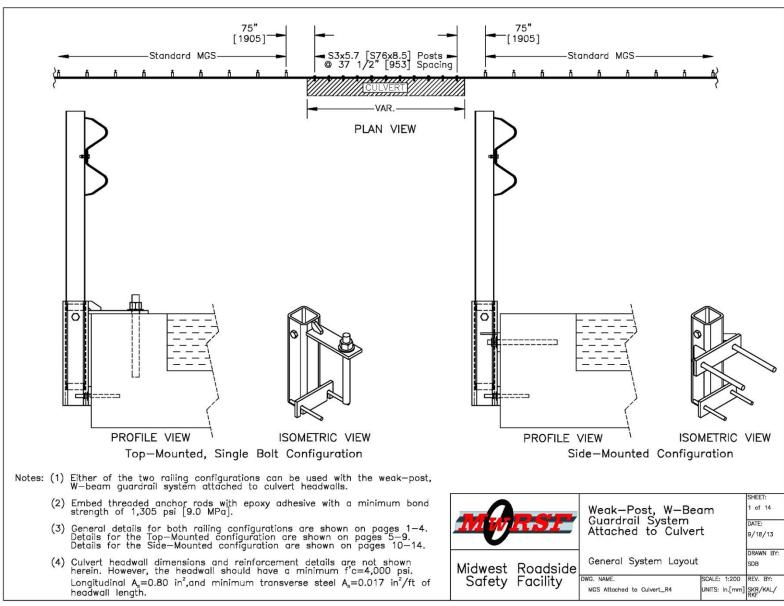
Weak-Post, W-beam Guardrail System on Culverts, System Layout
